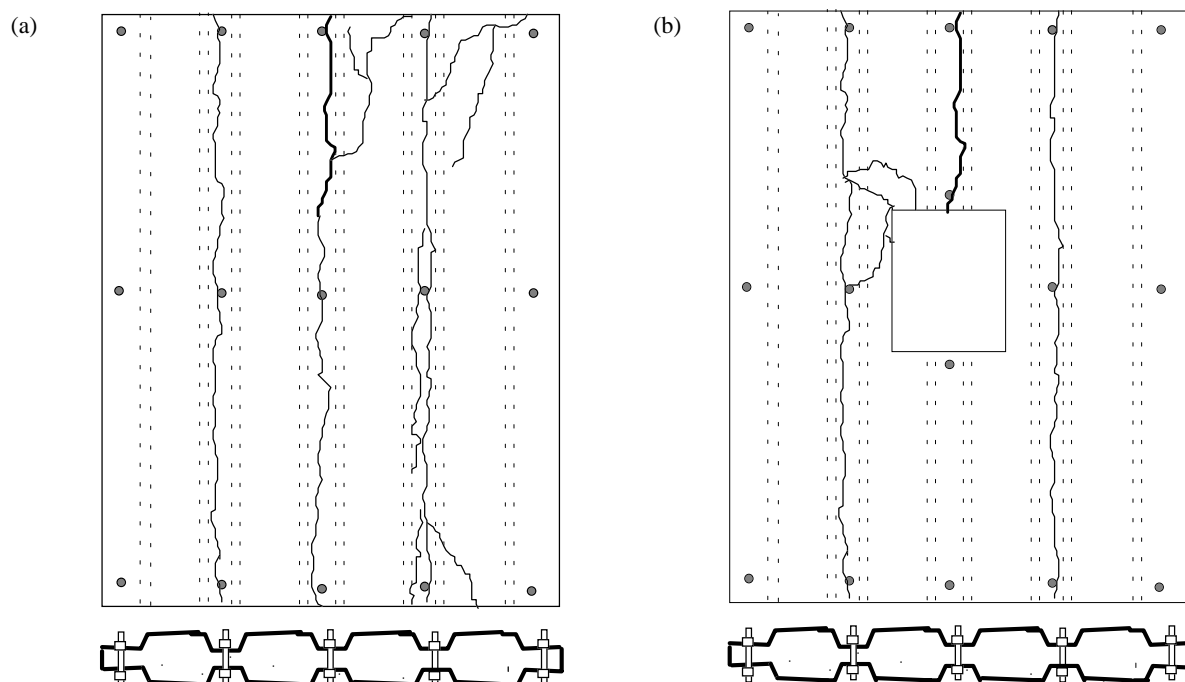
Crack propagation in Trimdek walls. (a) non-pierced wall; (b) pierced wall.
